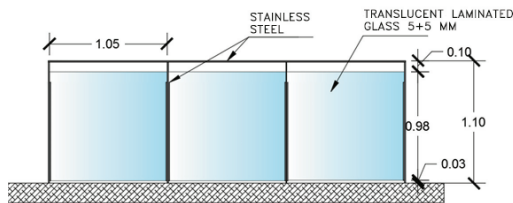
Terrace railings are made of stainless steel profiles and translucent laminated glass. Source: authors
